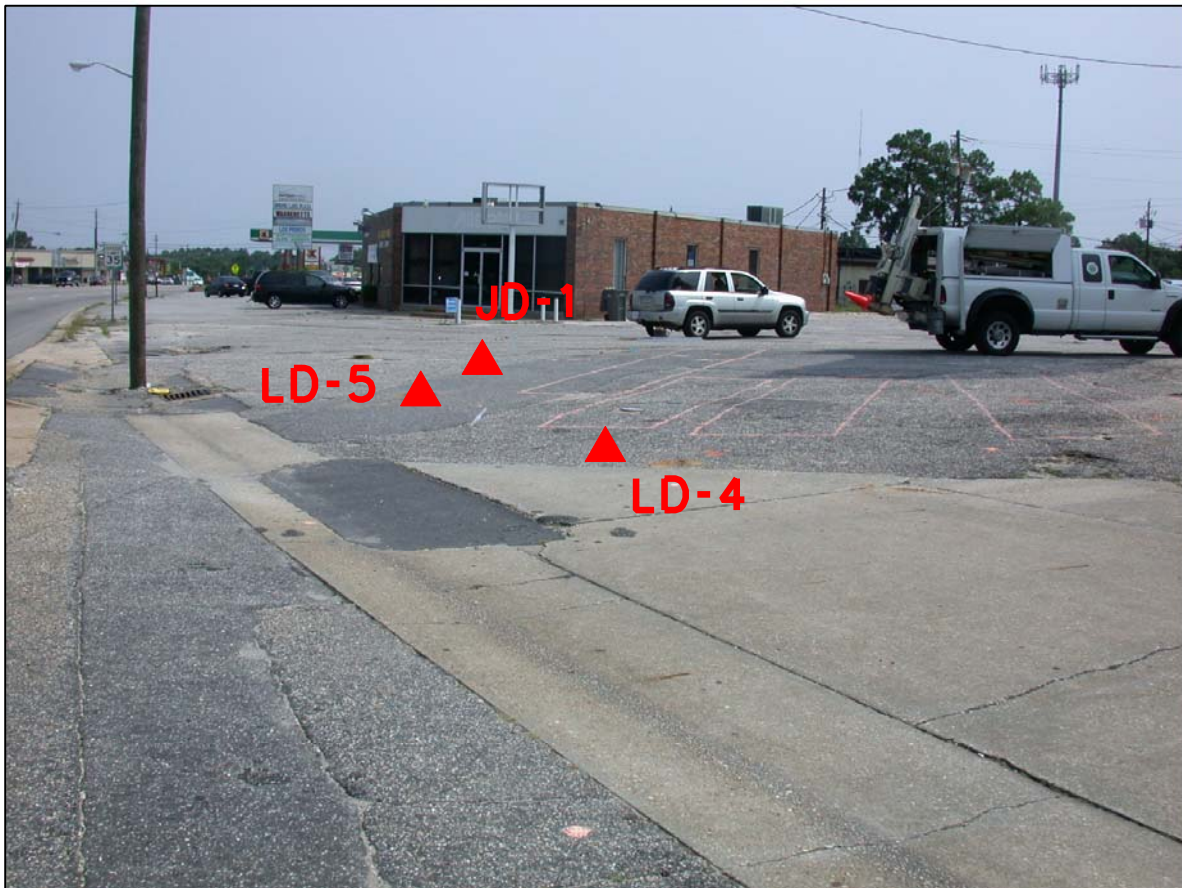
BORINGS WITHIN PROPOSED R/W LOOKING NORTHEAST
